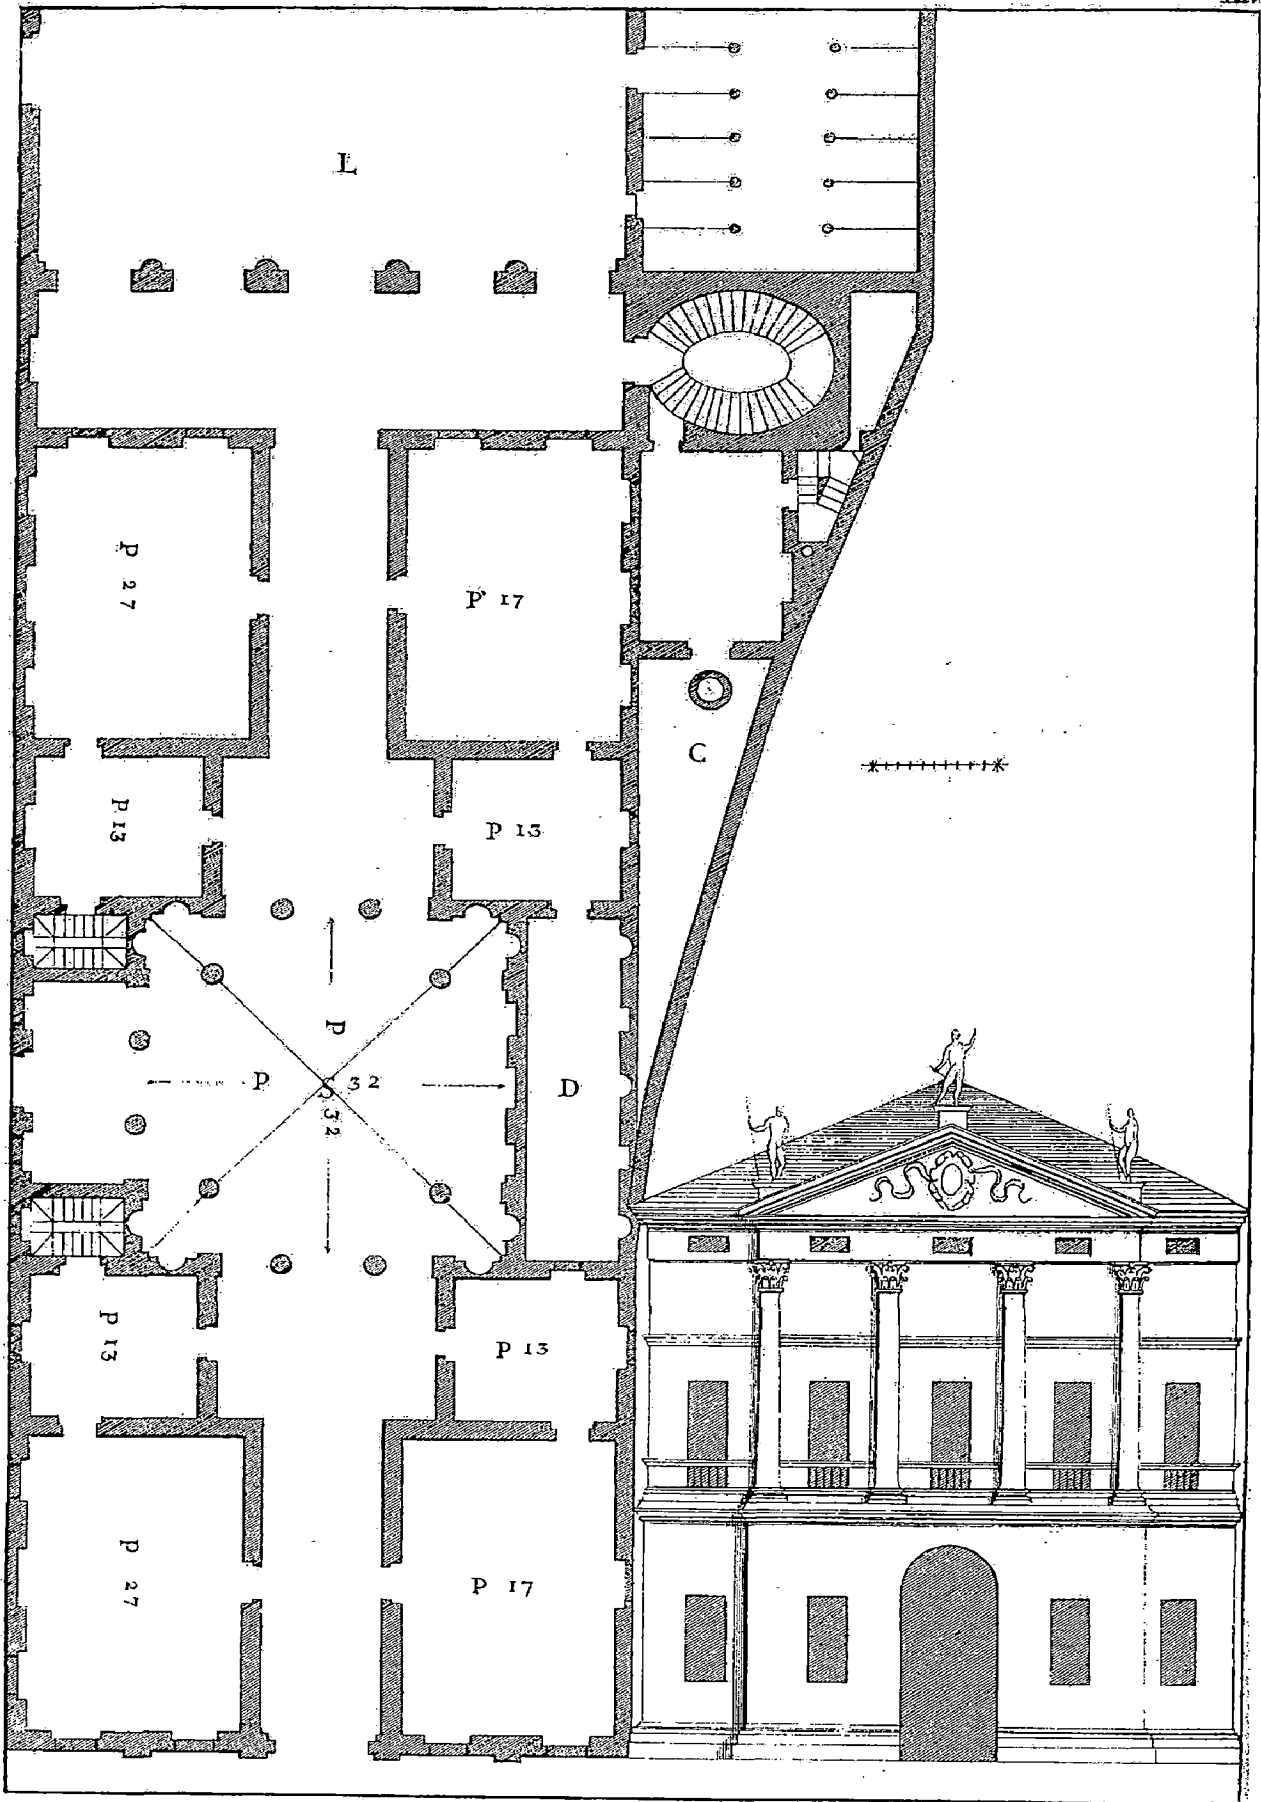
Palazzo Giulio Capra at Vicenza in plan and elevation
